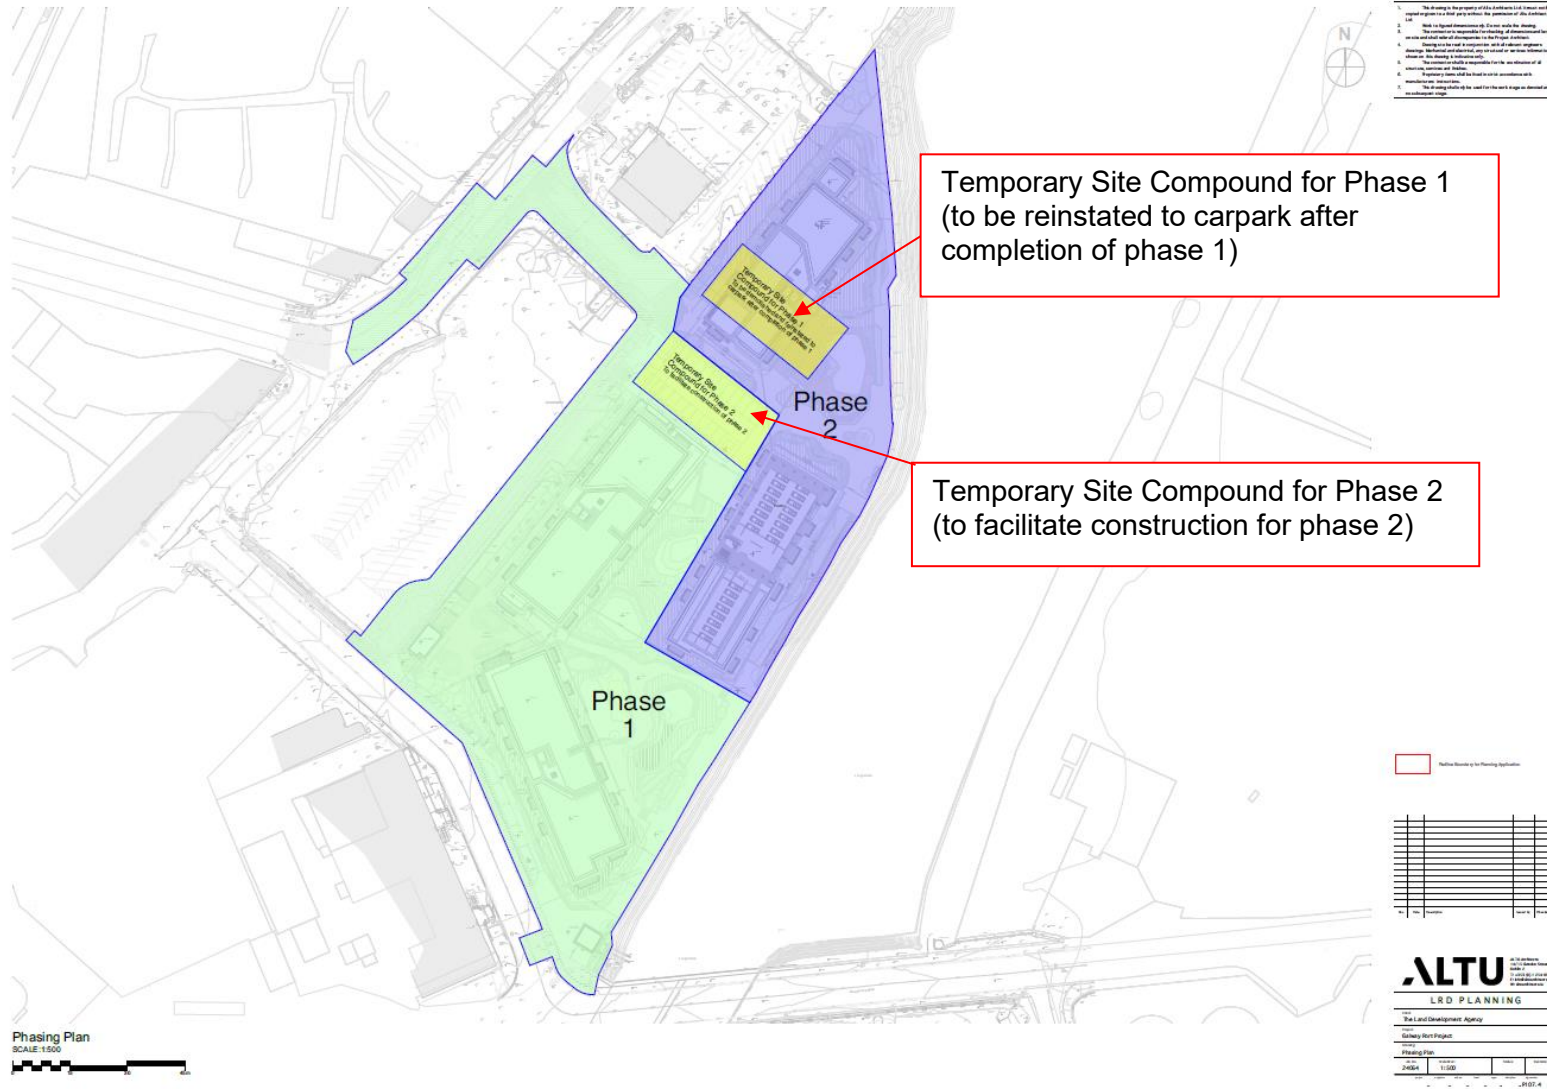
Site Construction Compound Layout (Altu Architects, 2025)
